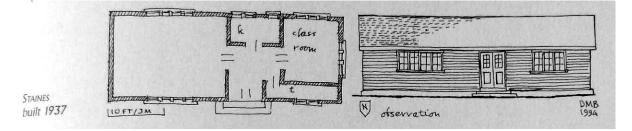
Plan and elevation of the 1937 Staines Meeting House (from Butler Vol. 1, p. 419)
